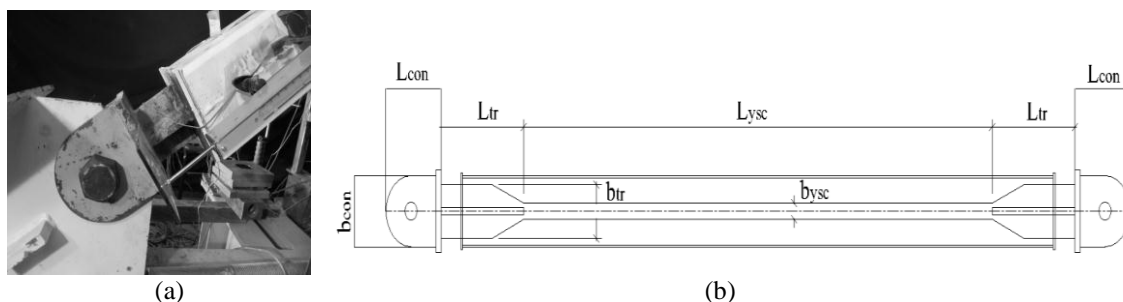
Specimen details, (a) General views from the end connection, (b) Elevation.
